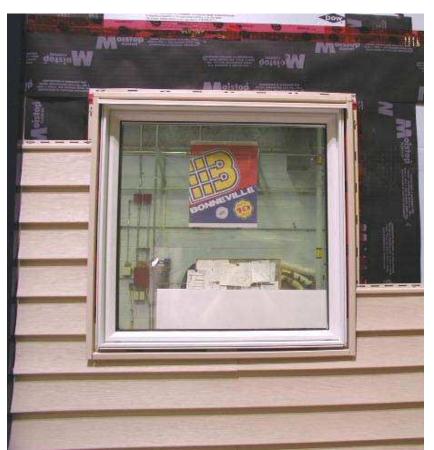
Specimen No.17. Installation of the vinyl siding and J-trim around the window frame
